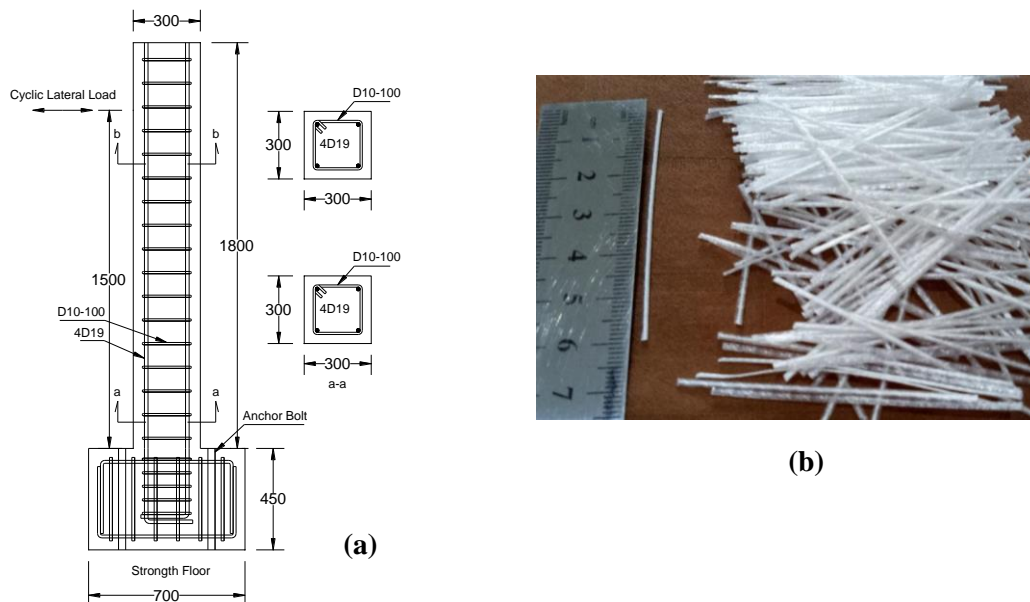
Test specimens: (a) reinforcing bars arrangement of columns (Note: all dimension in mm), (b) polypropylene macro-fibers
